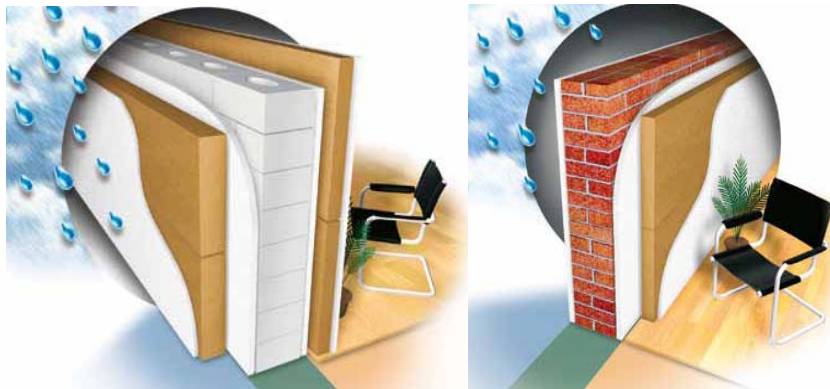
(a) Exterior insulation and (b) interior insulation on masonry blocks
